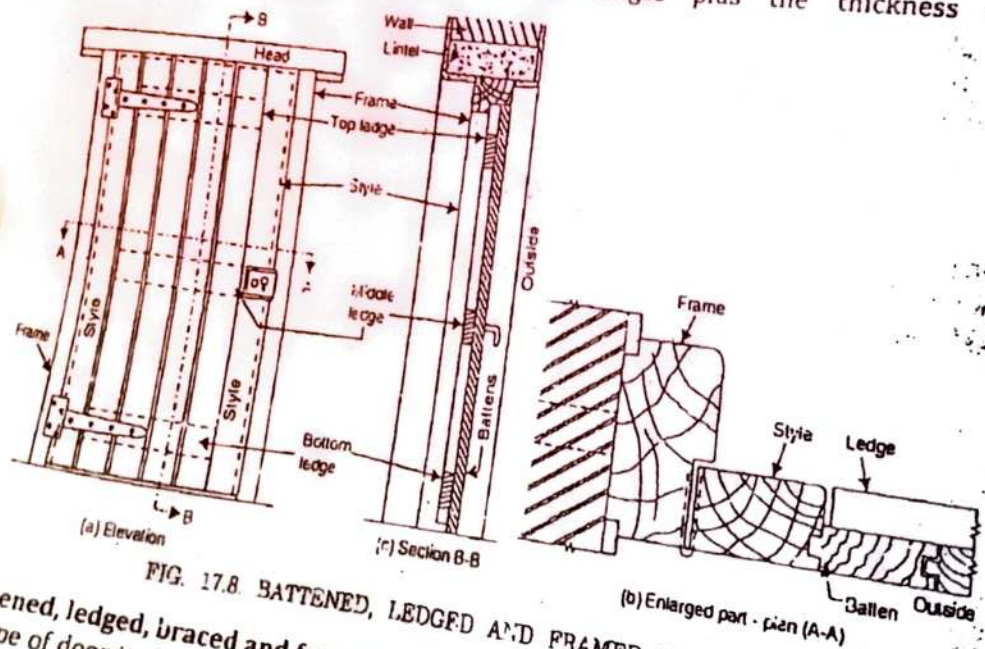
BATTED, LEDGED AND FRAMED DOOR
